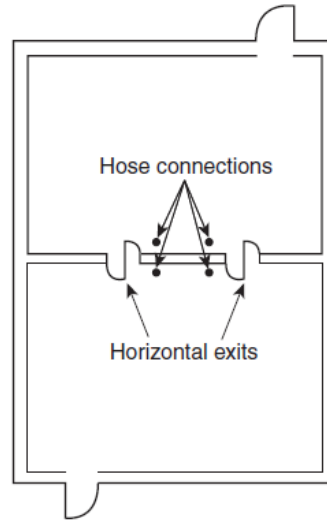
(b) Location of Hose Connections at Horizontal Exits.
